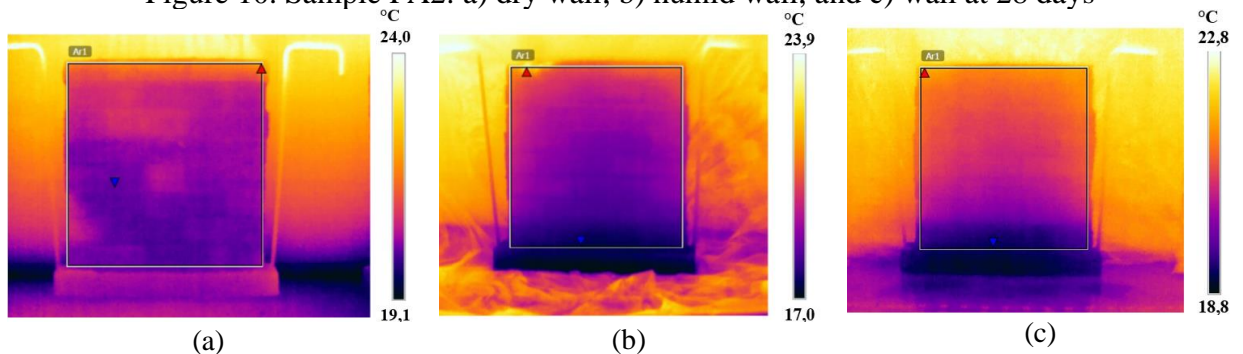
Sample PB1: a) dry wall; b) humid wall; and c) wall at 28 days
